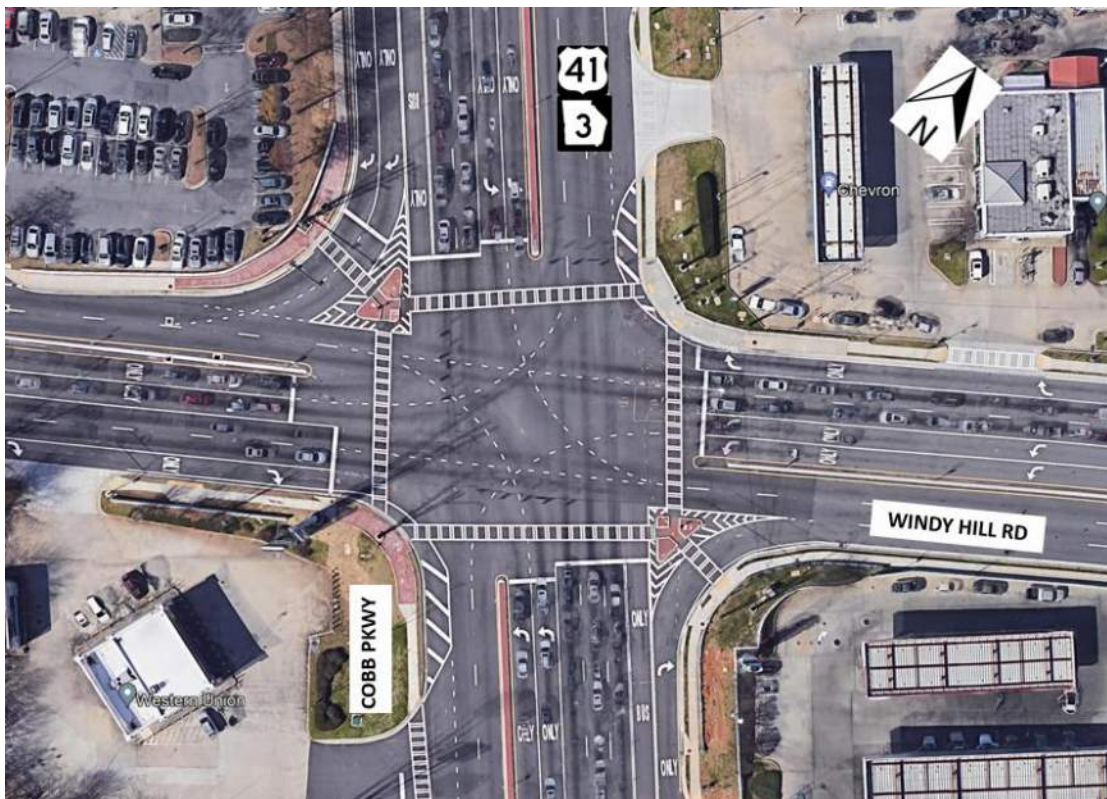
Aerial view of existing Cobb Parkway (US 41) / Windy Hill Road Intersection
